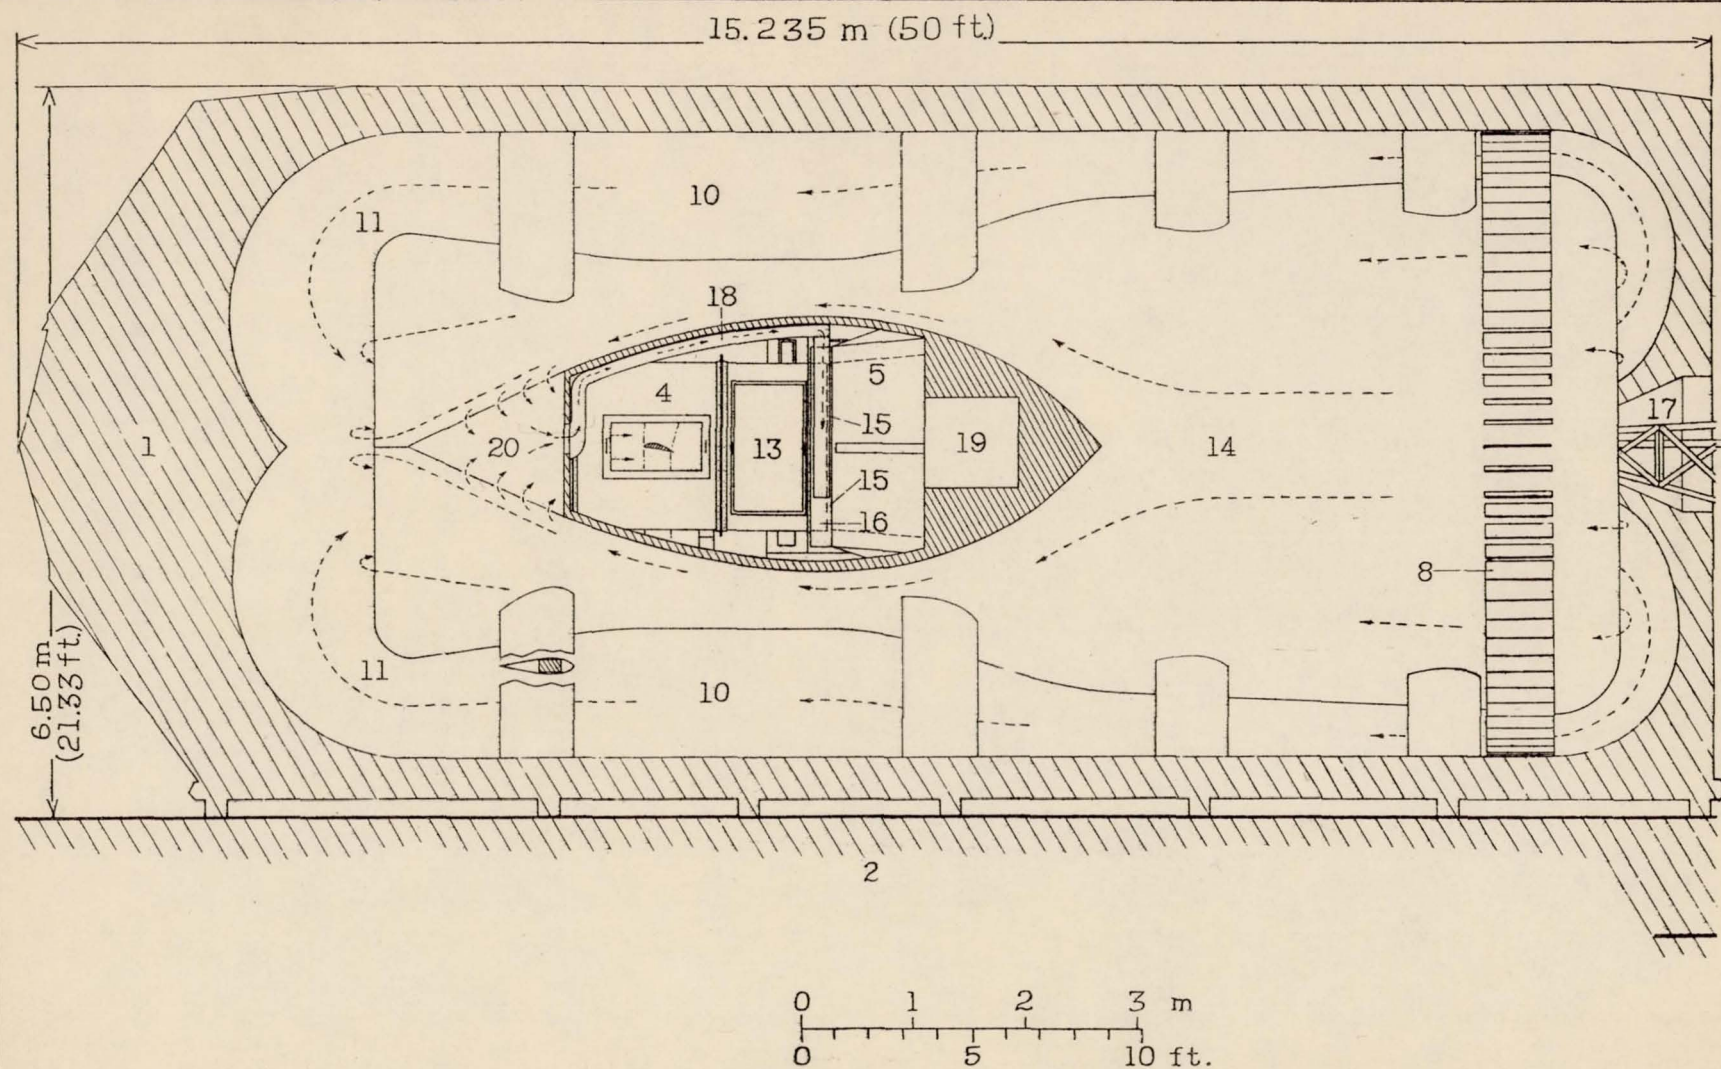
Longitudinal section and interior view of tunnel showing streamlined passage to experiment chamber. Tunnel of the Bucharest Polytechnic School.
